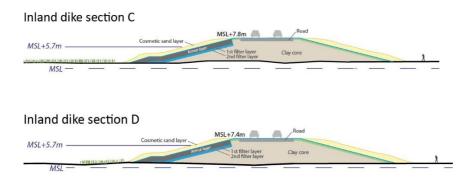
Cross section for inland barrier at section C (FM3005, Galveston Island) and section D (SH87, Bolivar Peninsula)
